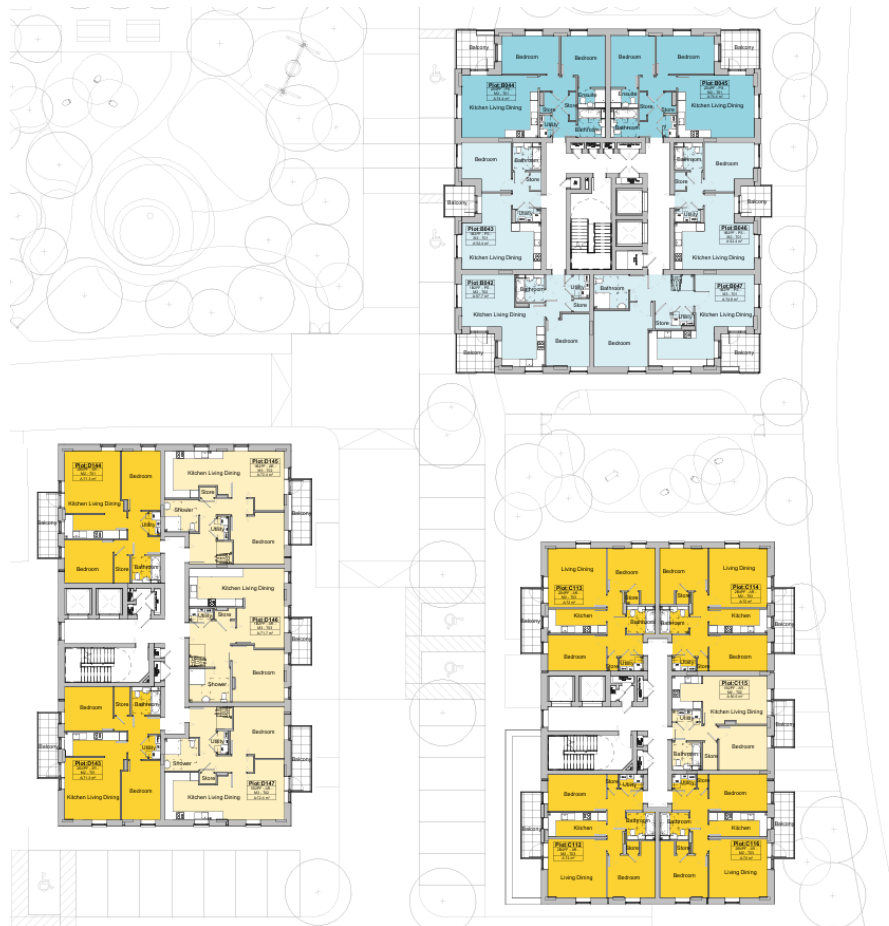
Extract from approved third floor plan plan showing separation between blocks.
